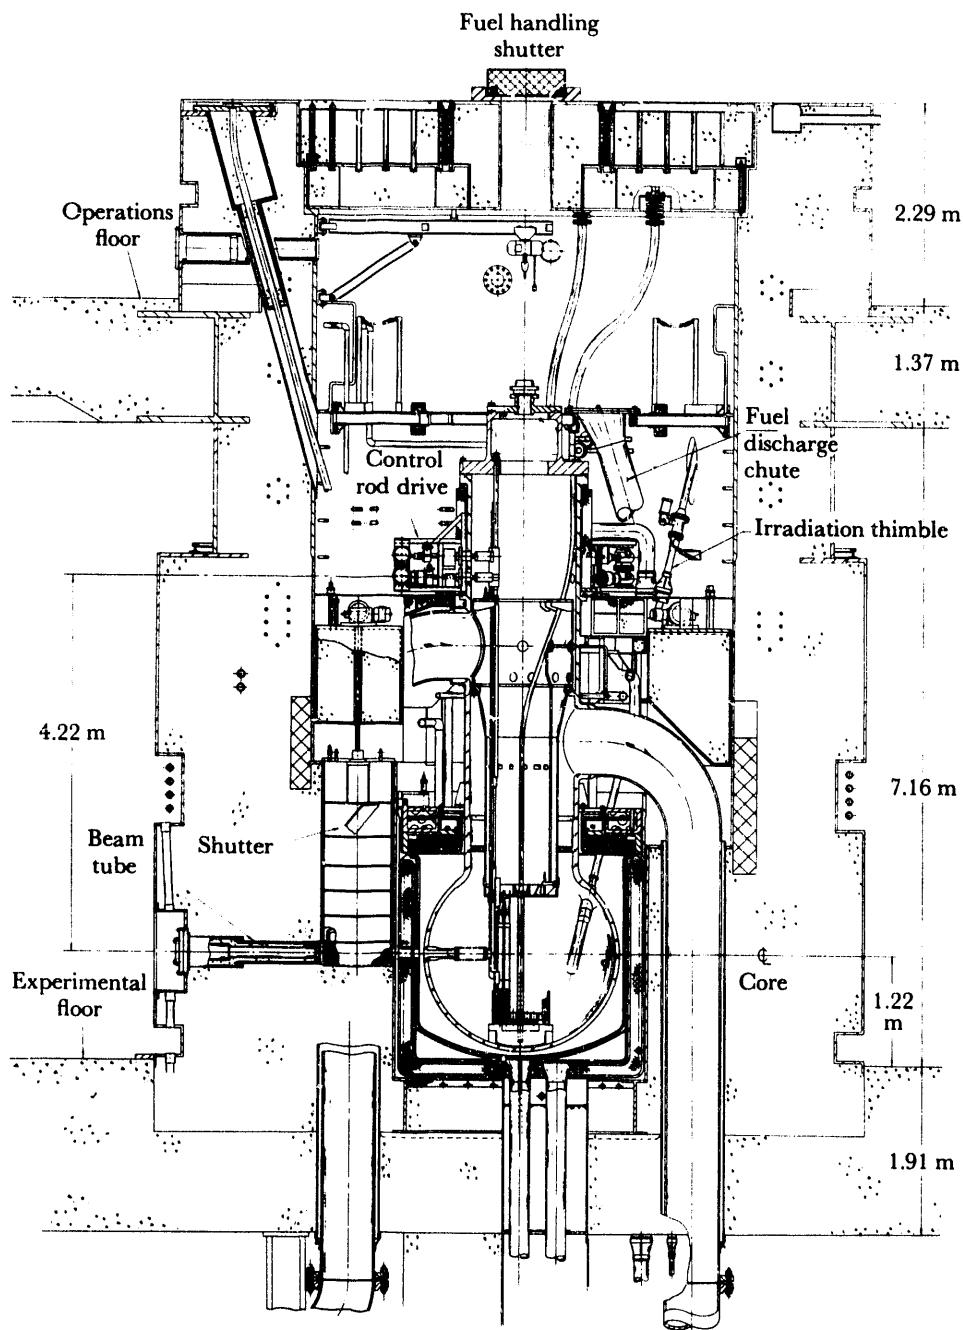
Elevation of the reactor vessel shielding, showing a typical beam tube, shutter, and thimble.
